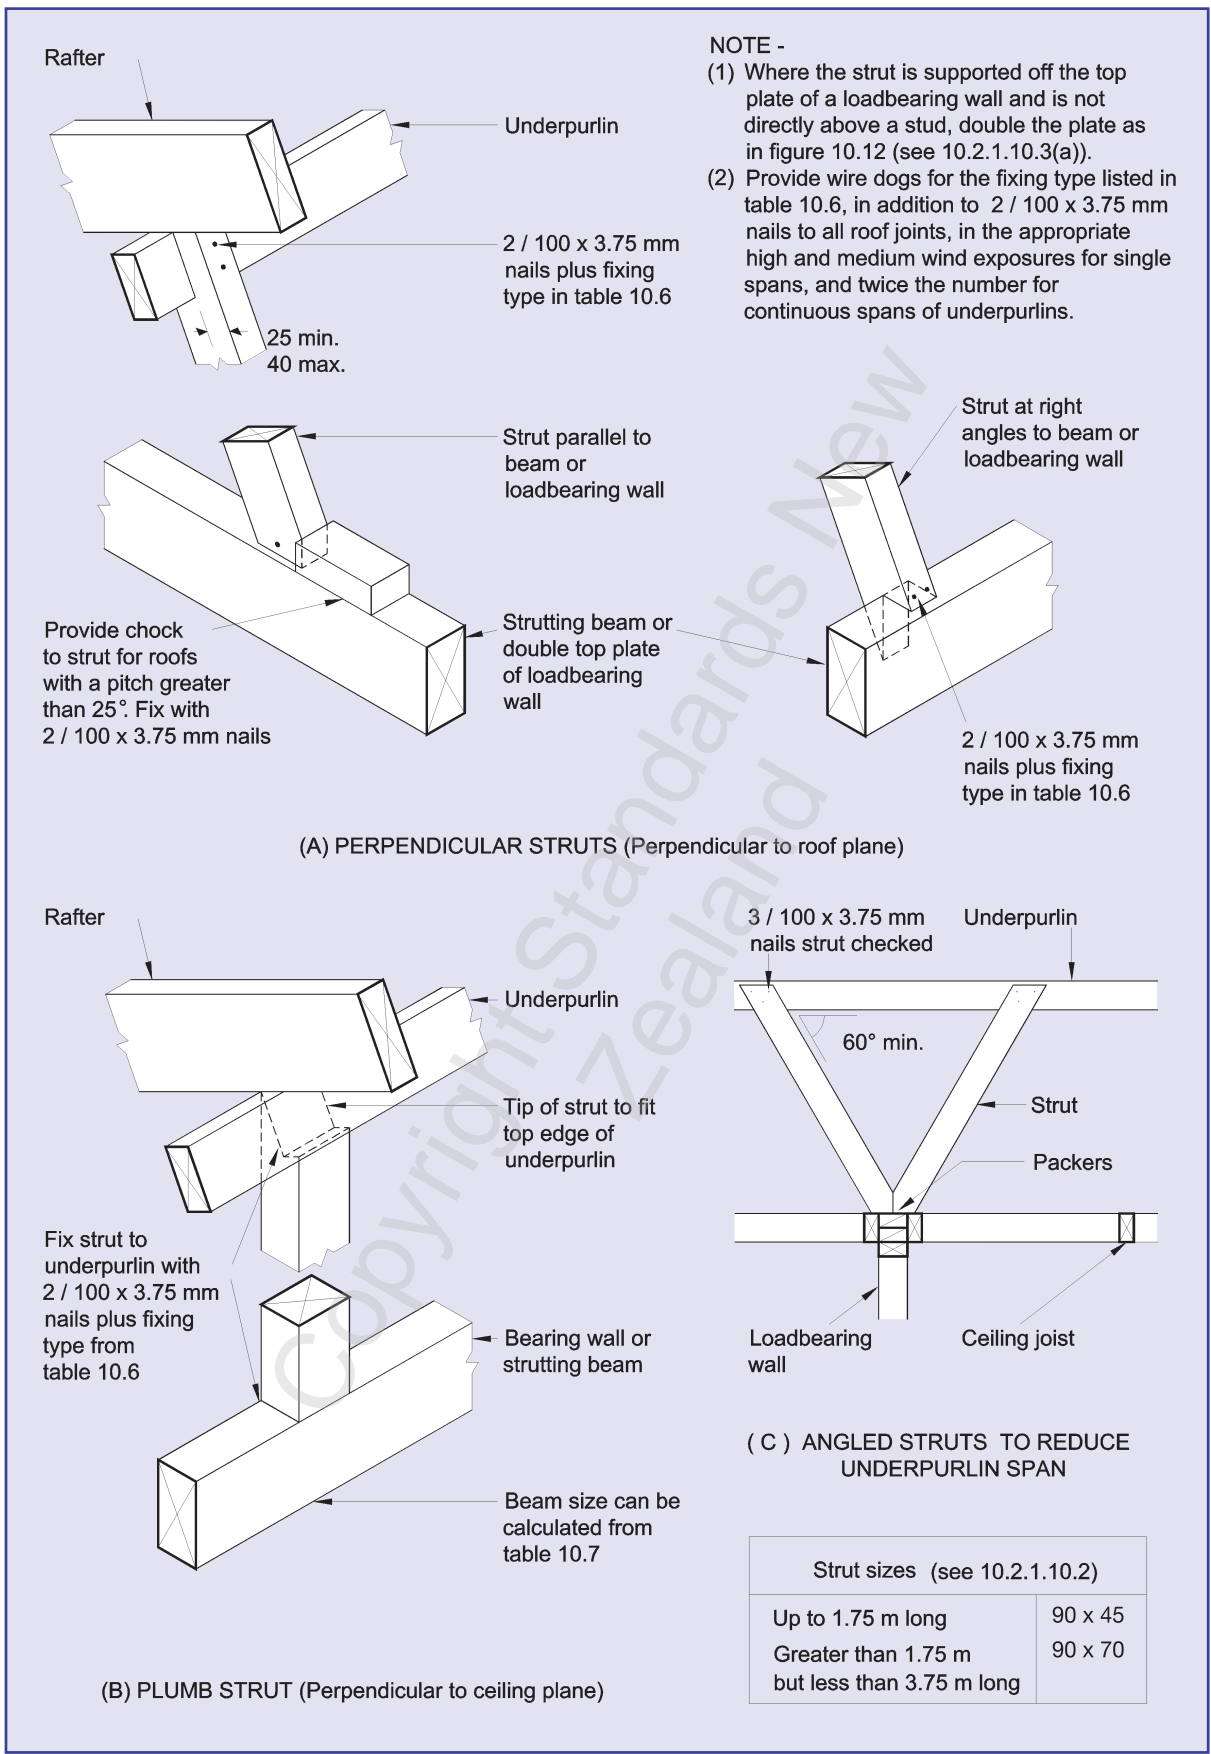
Underpurlin struts – Single (see 10.2.1.10.1(a))
